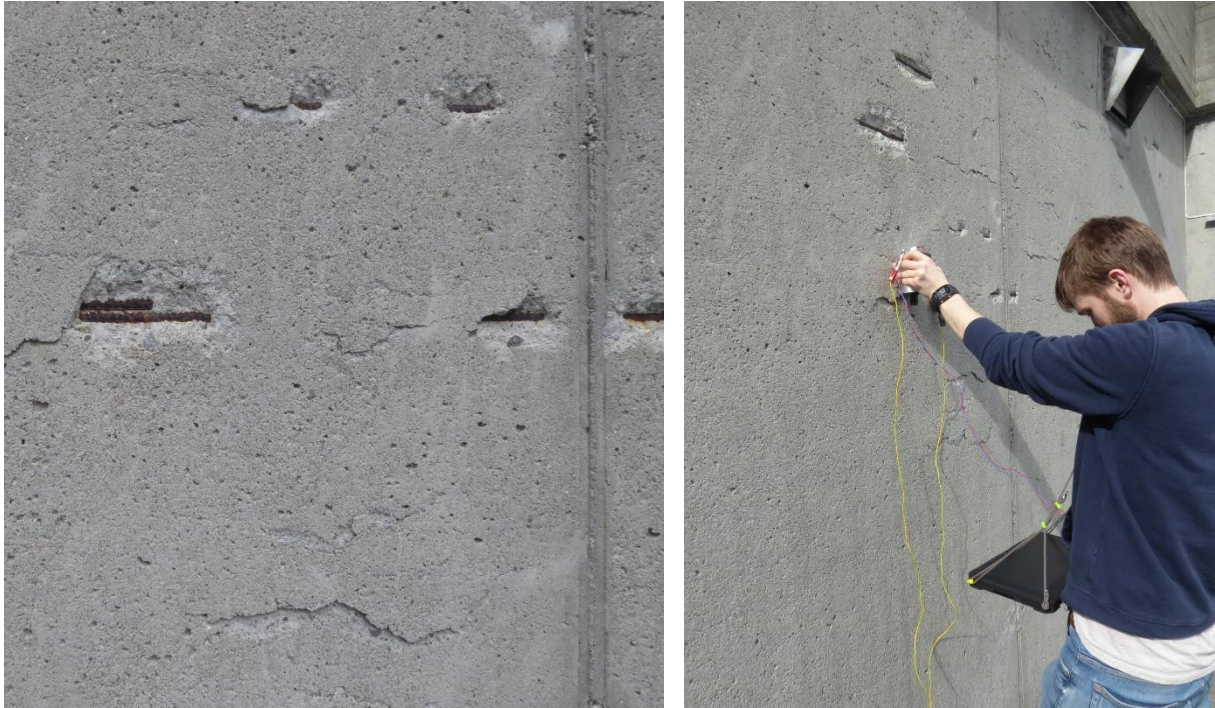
The first outdoors test of the FKP on a concrete wall with cracks and heavily corroded rebars. The FKP being controlled via Bluetooth from a tablet is shown in the picture to the right.
